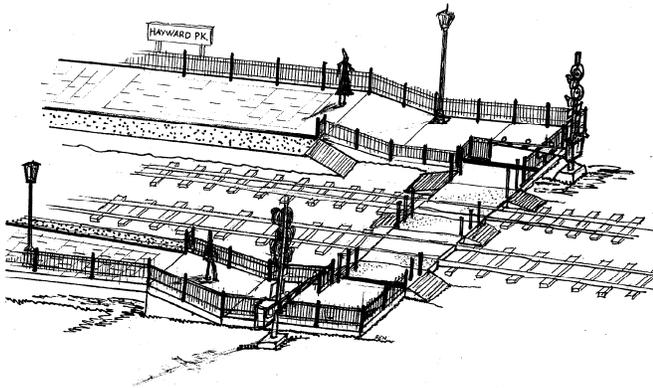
shows an example of a station layout with a pedestrian-only crossing at each end of the platforms. Typically there are two platforms, each located on the outside of, rather than between, the tracks.
